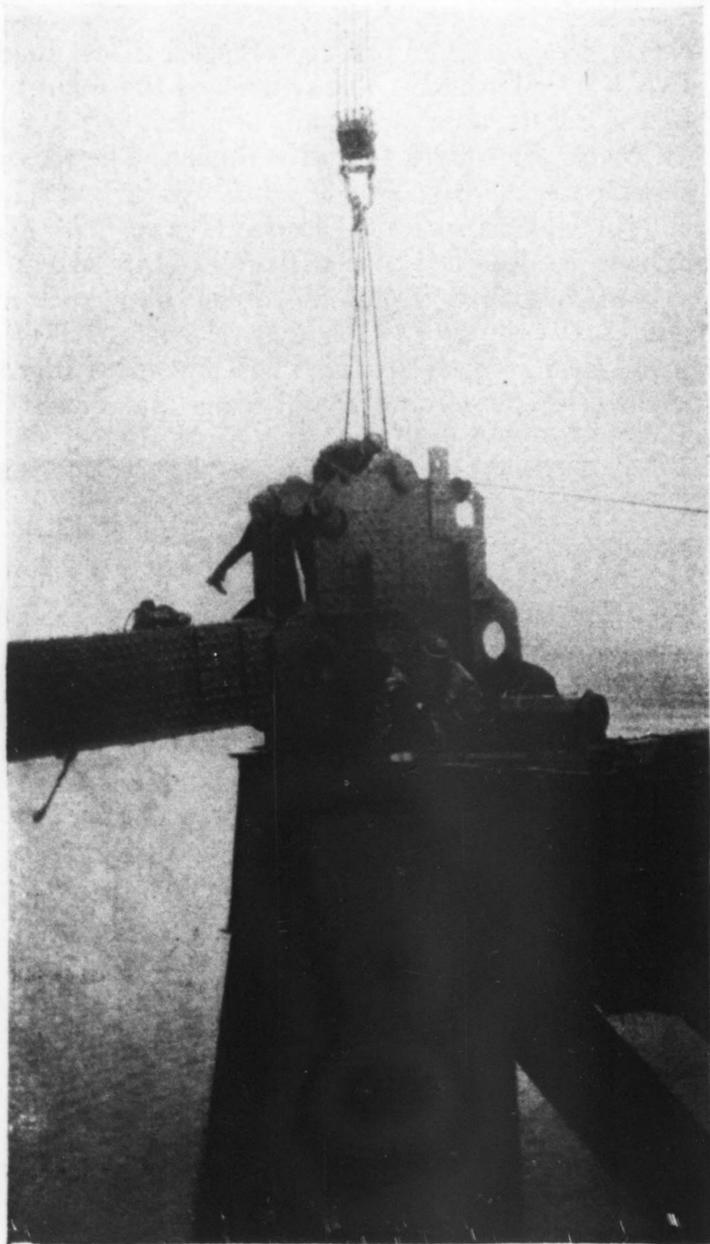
SETTING MAIN SHOE ON TOP OF TOWER AT PIER 2
